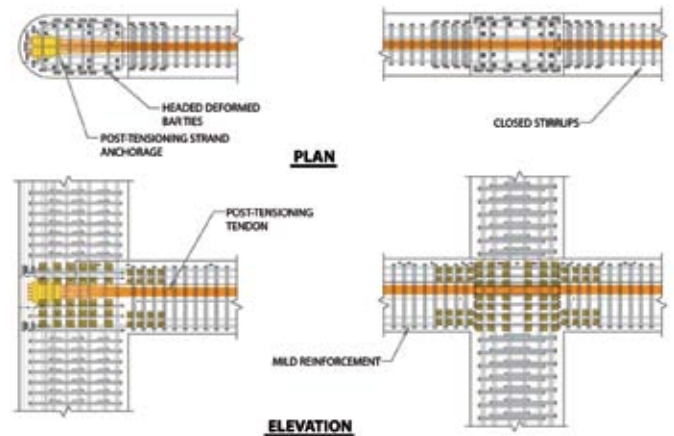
Typical reinforcement details at the intersection of the columns and the post-tensioned beams for the two lateral force-resisting frames
